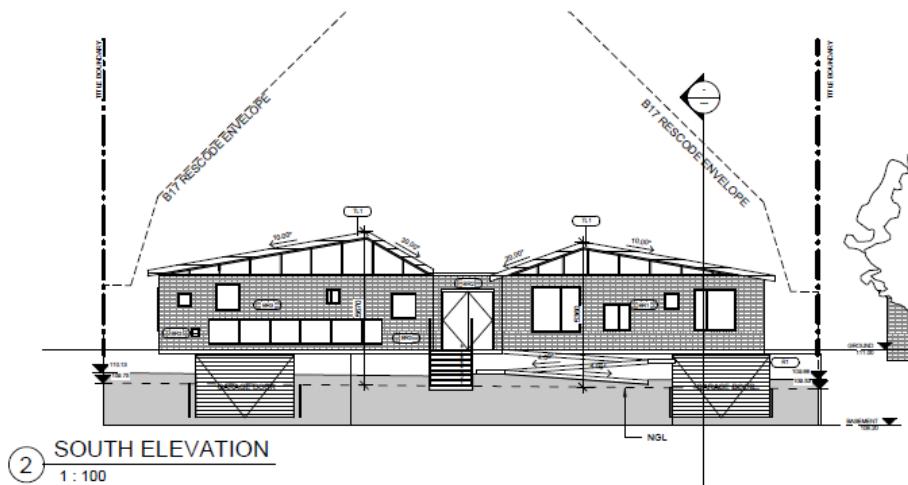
The proposal - South elevation (ADA Architects, 2023)
